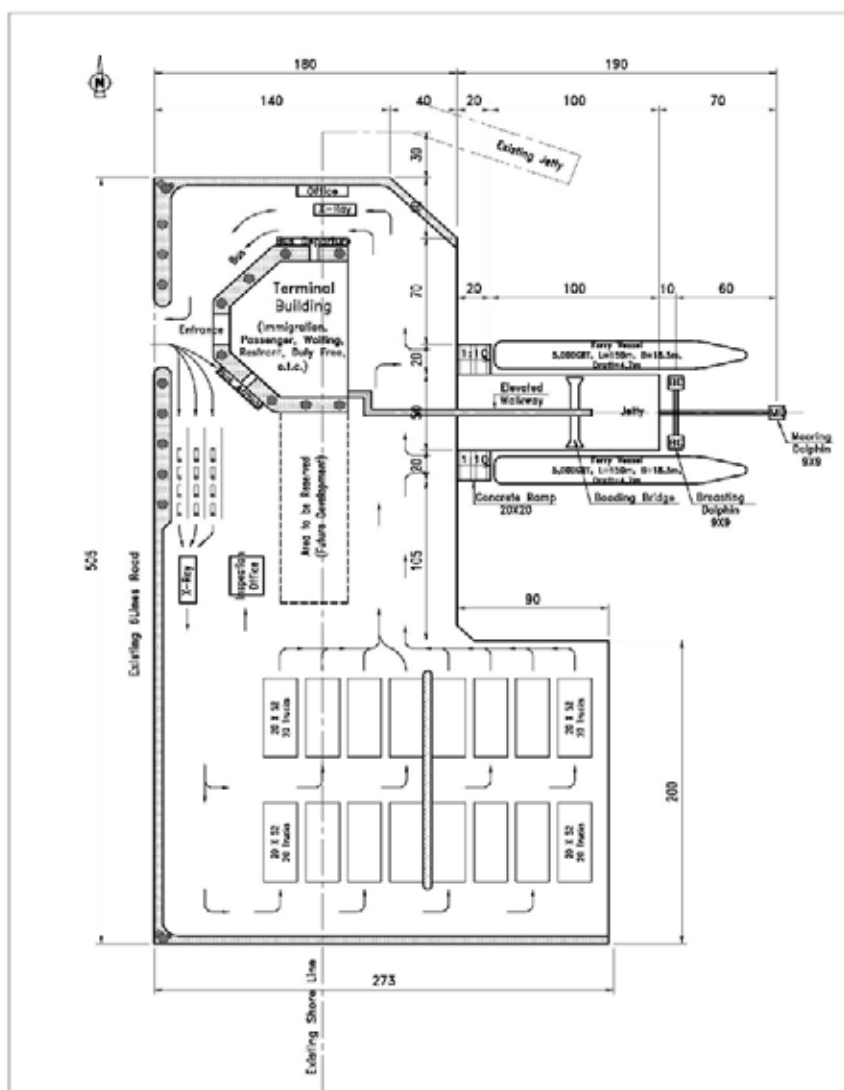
General Plan of Ro-PAX Ferry Terminal Conceptual Development Plan
